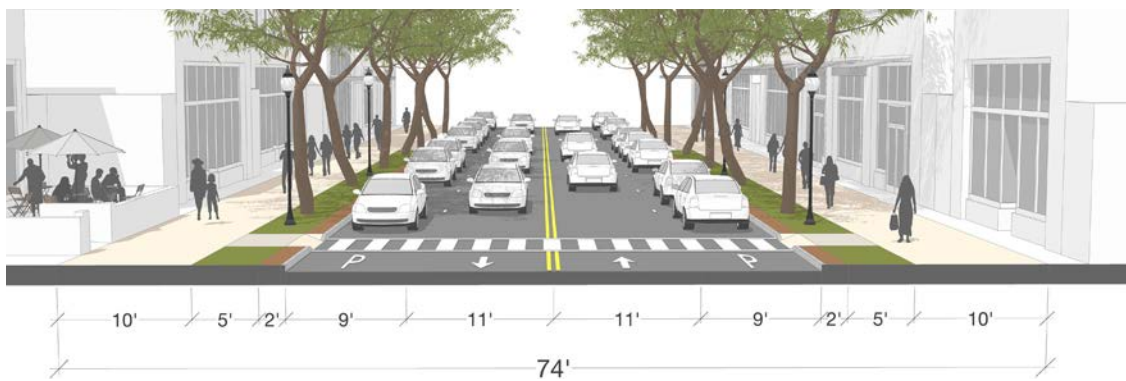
West Barraque Improvements - Existing Redevelopment Plan
